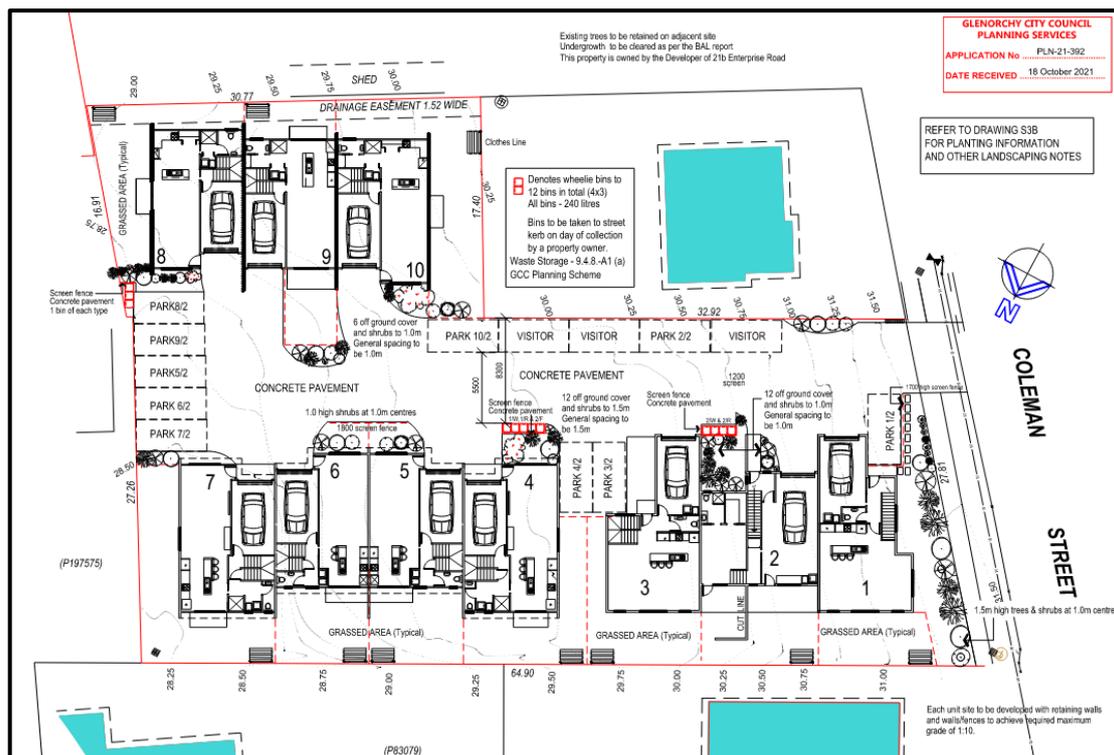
Site plan of proposal at 21 Coleman Street, Moonah.
